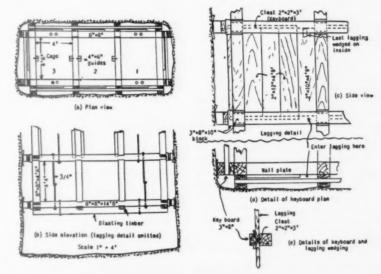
Arrangement of timbering and keyboard lagging, Jim Crow shaft
